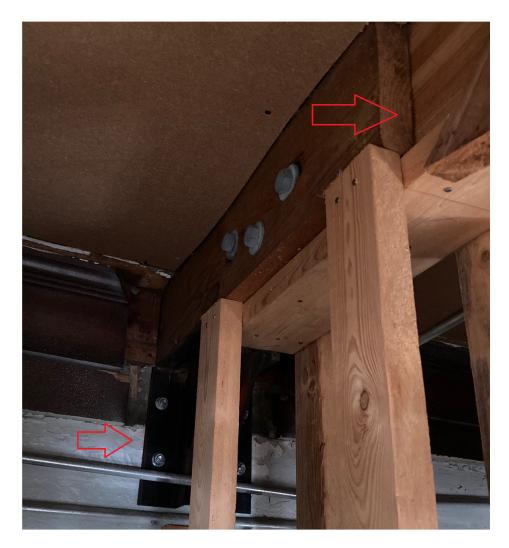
Retrofit seat and repaired (spliced) truss chord at south truss
